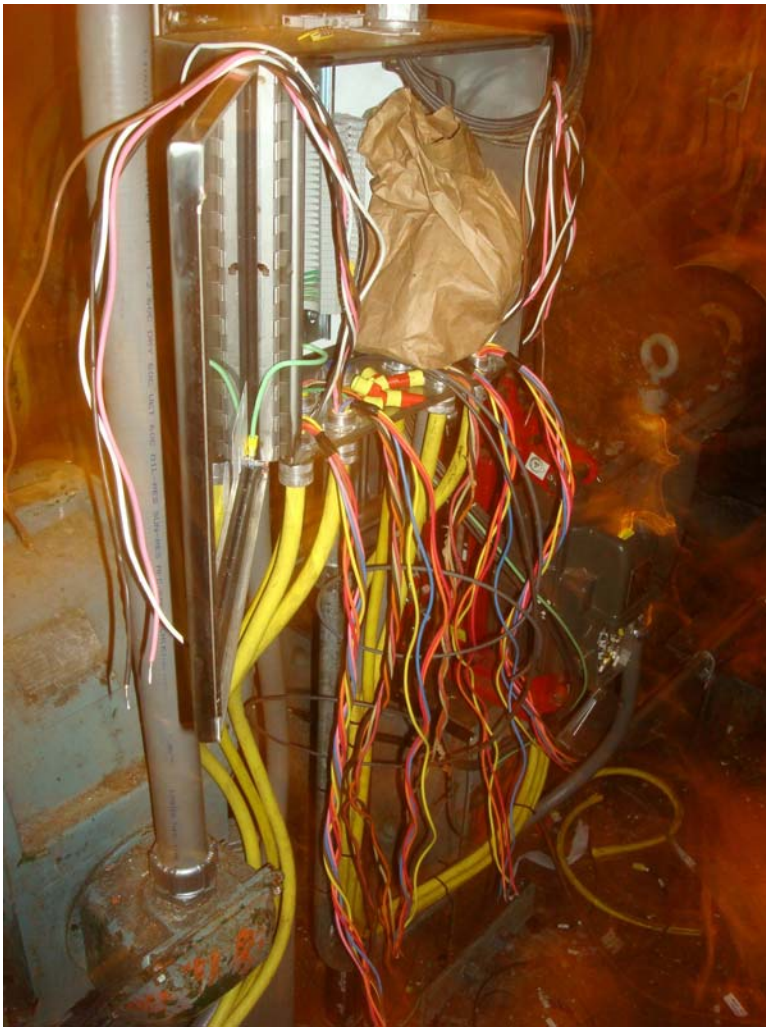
The wiring for the motor and machinery brake and limit switches is in progress.
